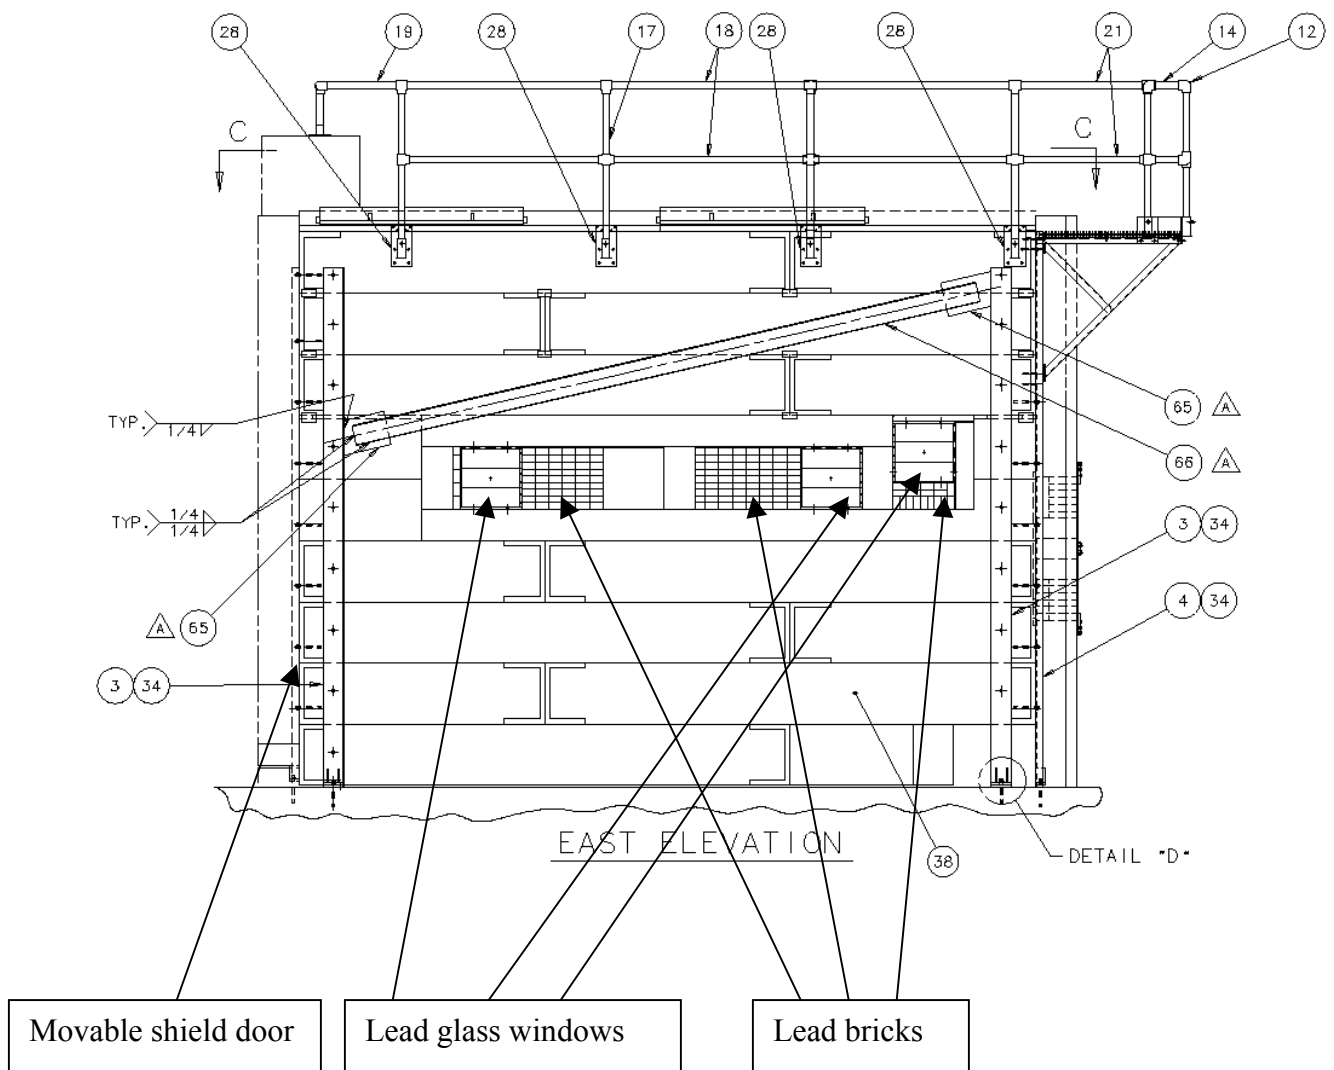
Side elevation view of East wall of Hot Cell.
